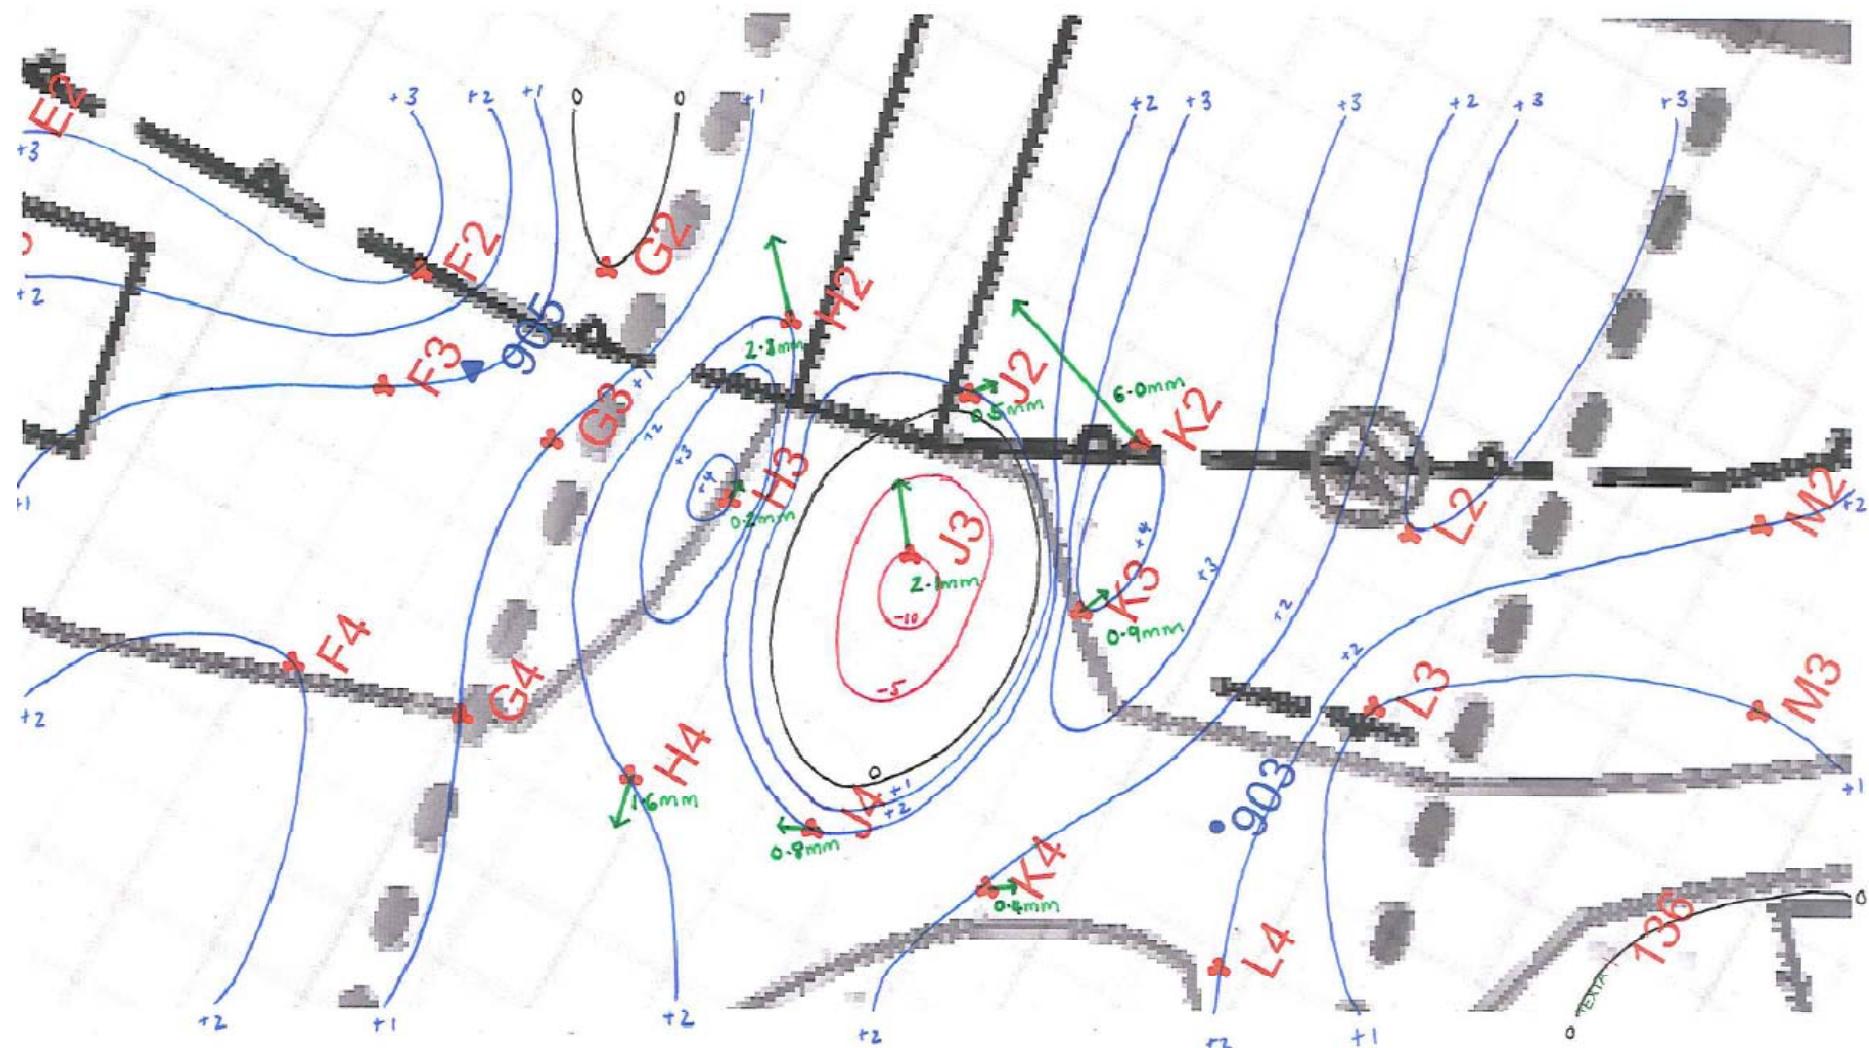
Section 1 Sketch Plan of Lateral and Vertical Movement
